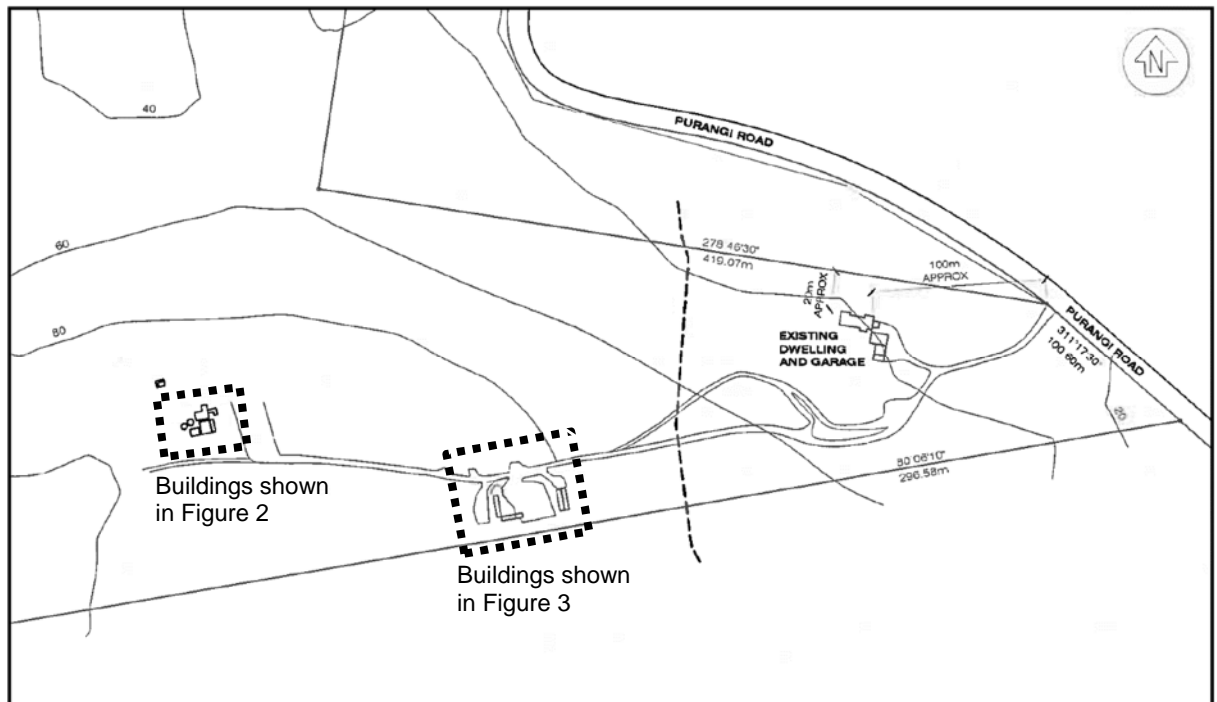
Overall site plan showing the location of buildings in Figures 2 and 3 (not to scale)
